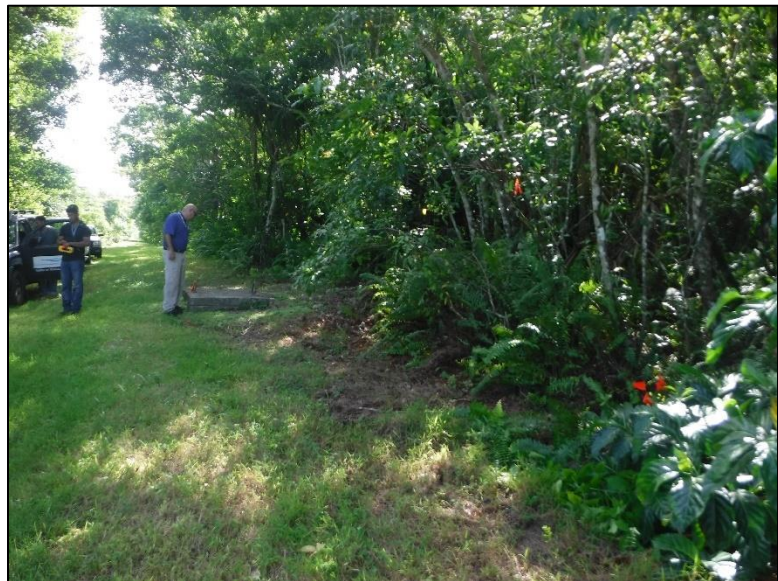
General location for NCSF-DW1. Note utility manhole access on right-of-way.
